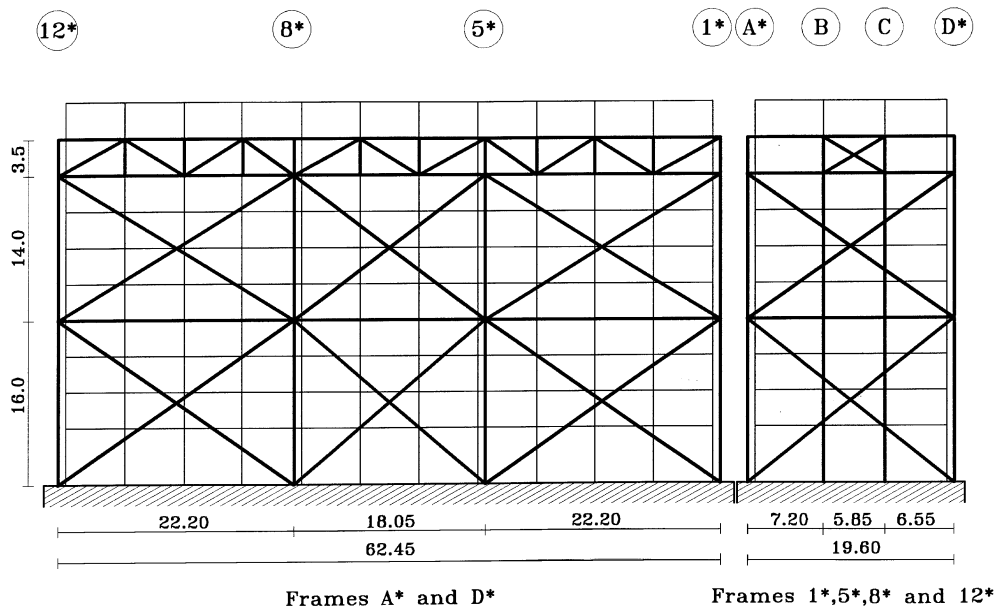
Elevations of the existing MBF retrofit (dimensions in meters)
